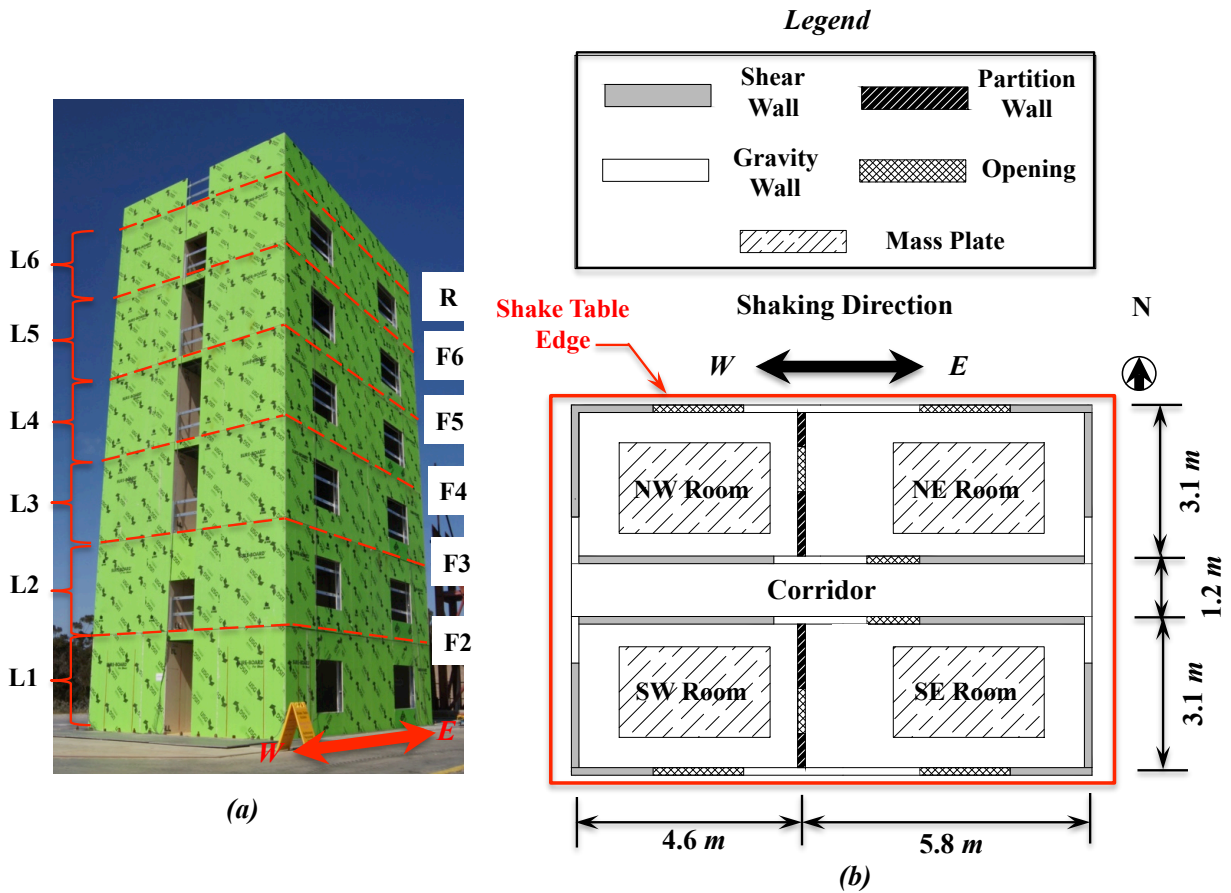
Test building: (a) isometric view, and (b) building plan layout (typical of floor 2 to 6, note that floor 1 is identical sans the transverse partition walls).
